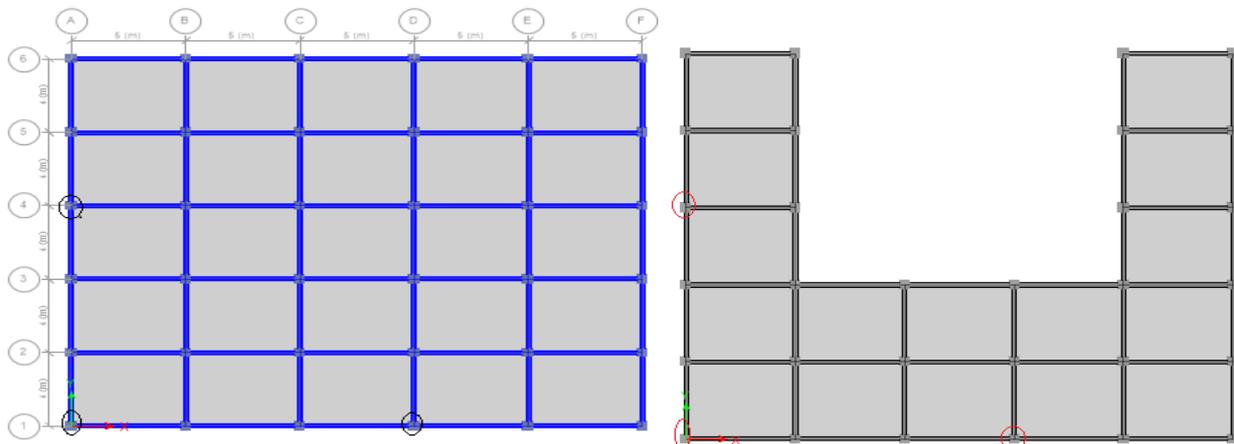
Column removal cases of typical and atypical structure-C shape
